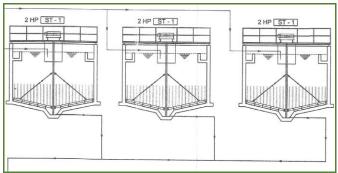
STP stage 3rd -- On Site Drawings and Plans
